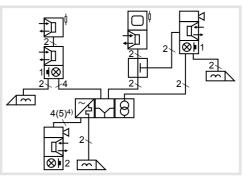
Installation audio/video apartment stations Floor push-buttons must be illuminated separately.
